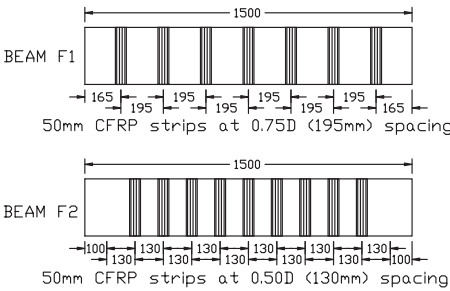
CFRP layout of strengthened Beams F1 and F2.
